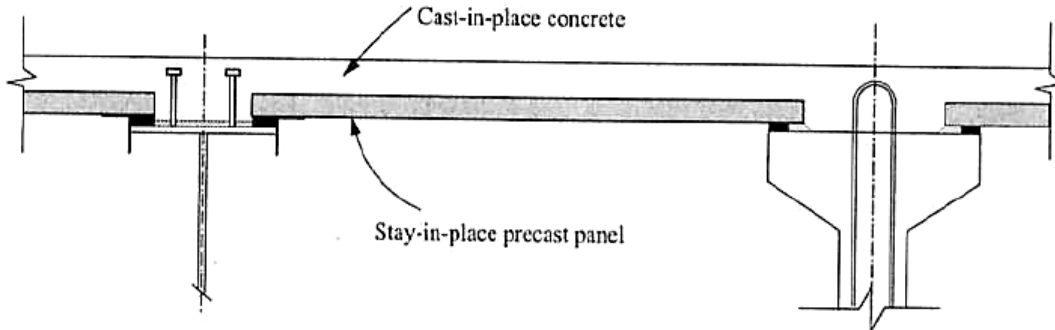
Cross section of a partial-depth precast concrete panel system (Tadros and Baishya, 1998)
